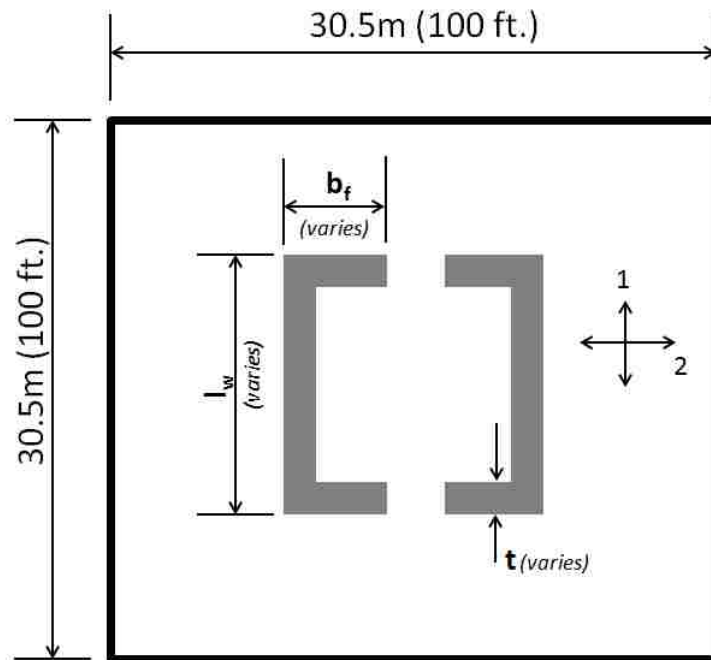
Plan View of Walled Building and Walls (NTS)
